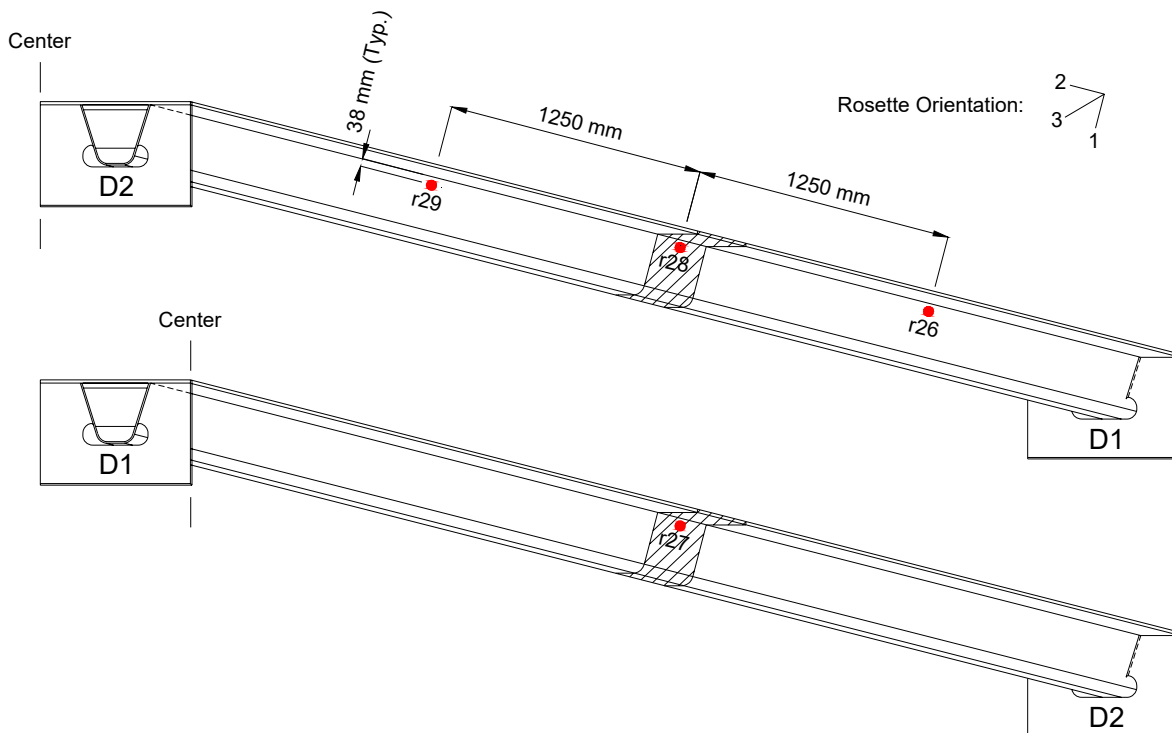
Specimen 5: Strain Gages in Inner Surface of Rib R2 near Rib-to-Deck Welds
